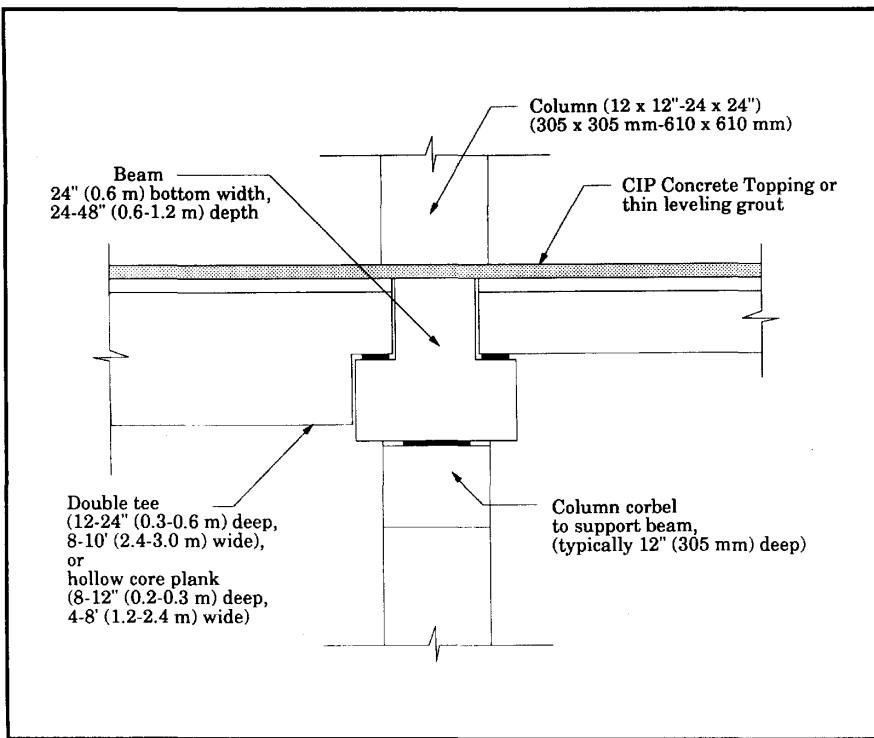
Conventional system — Cross section through beam with typical dimension ranges.
